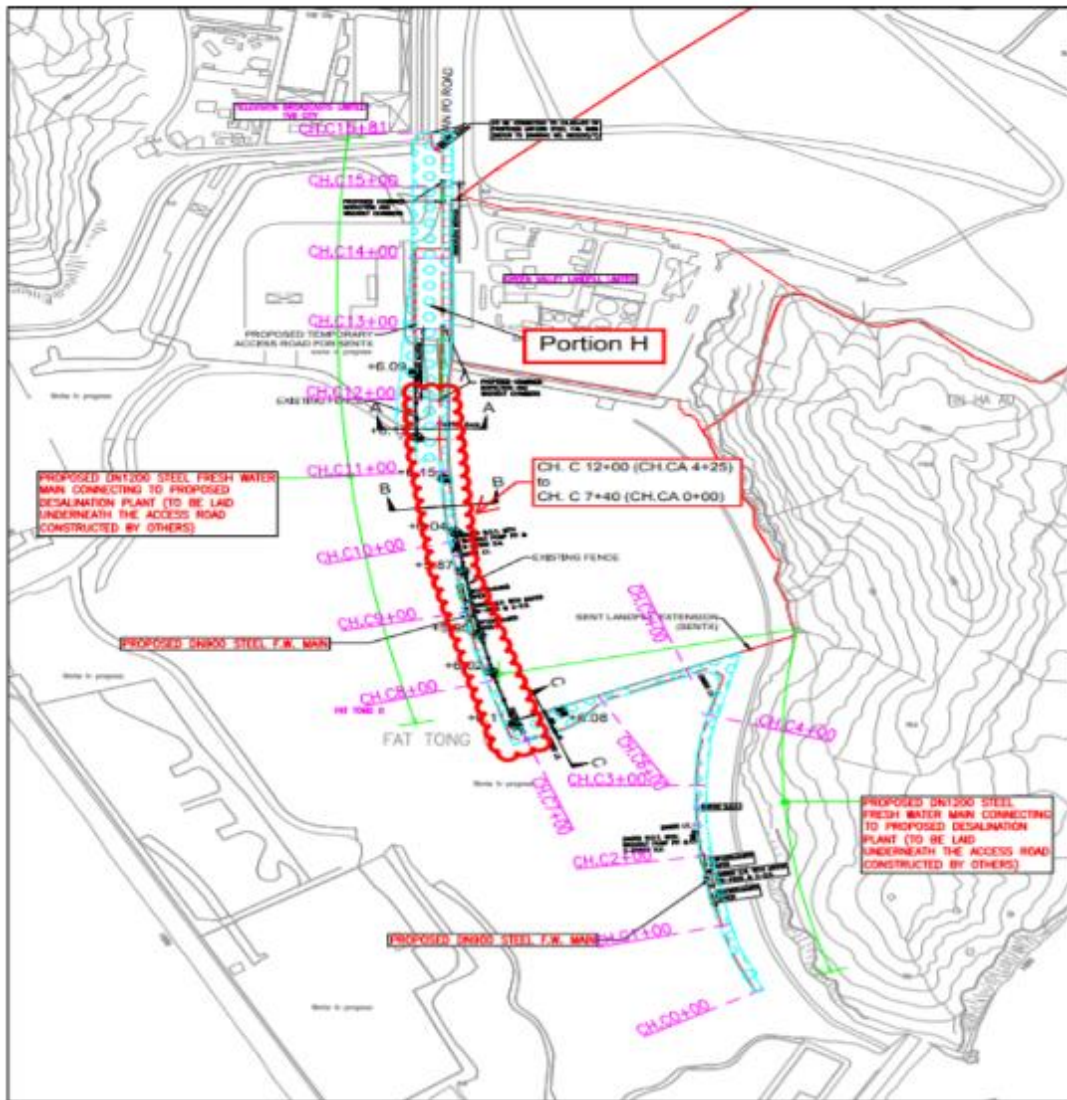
Location Plan for Portion H– CH.C 7+40~CH.C 12+00 (CH.CA 0+00 ~ CH.CA4+25)
